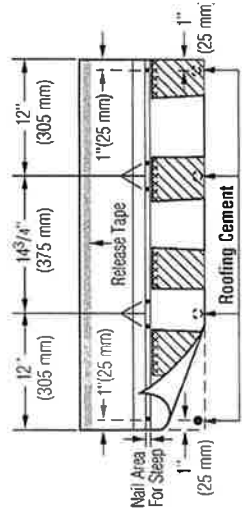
Use six nails and four spots of asphalt roofing cement on steep slopes.
